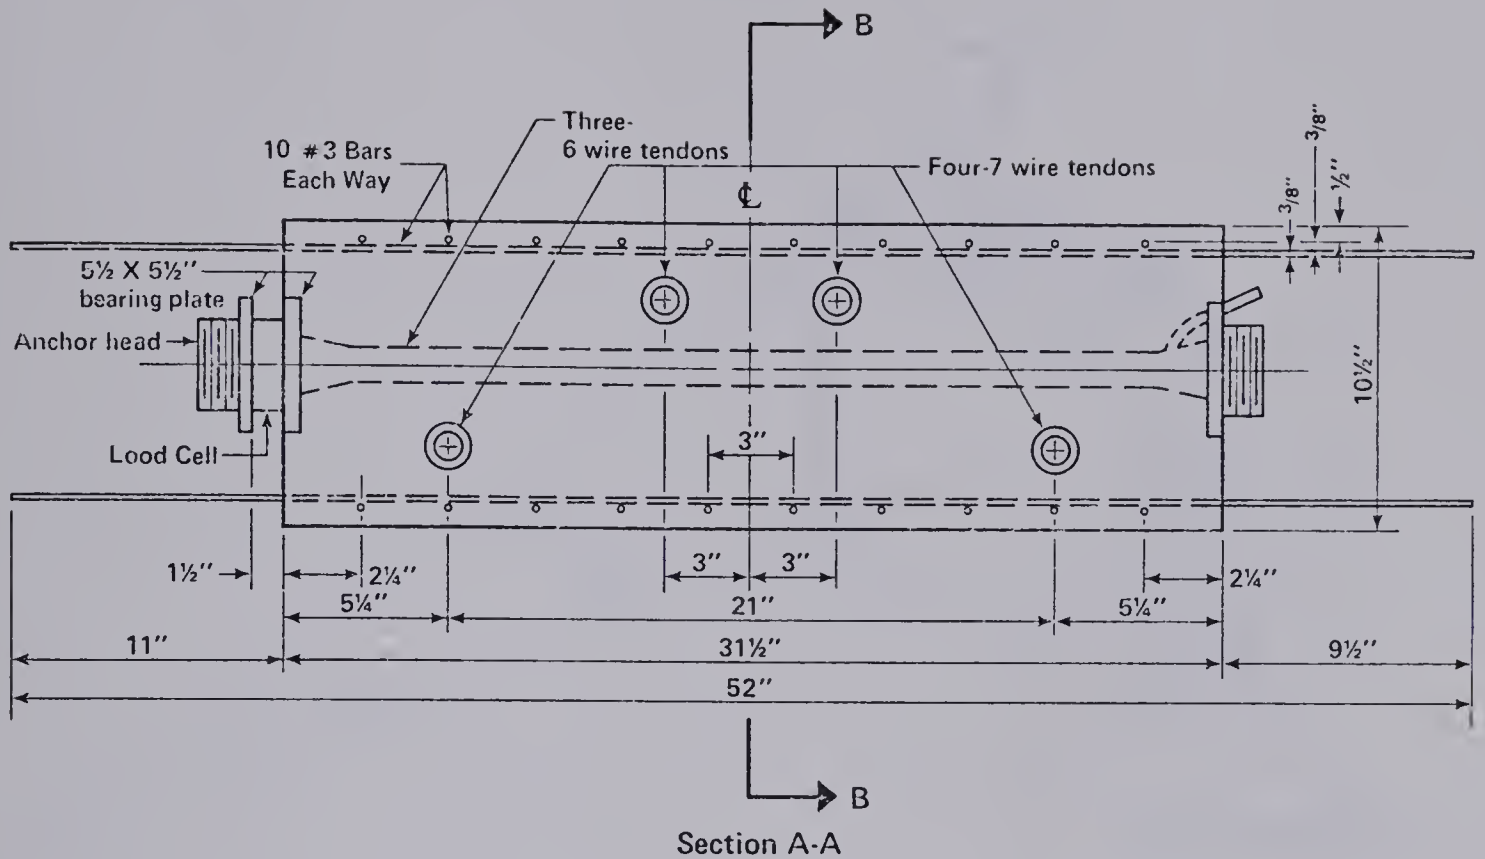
Typical Section A-A Through Wall Segment Specimen
